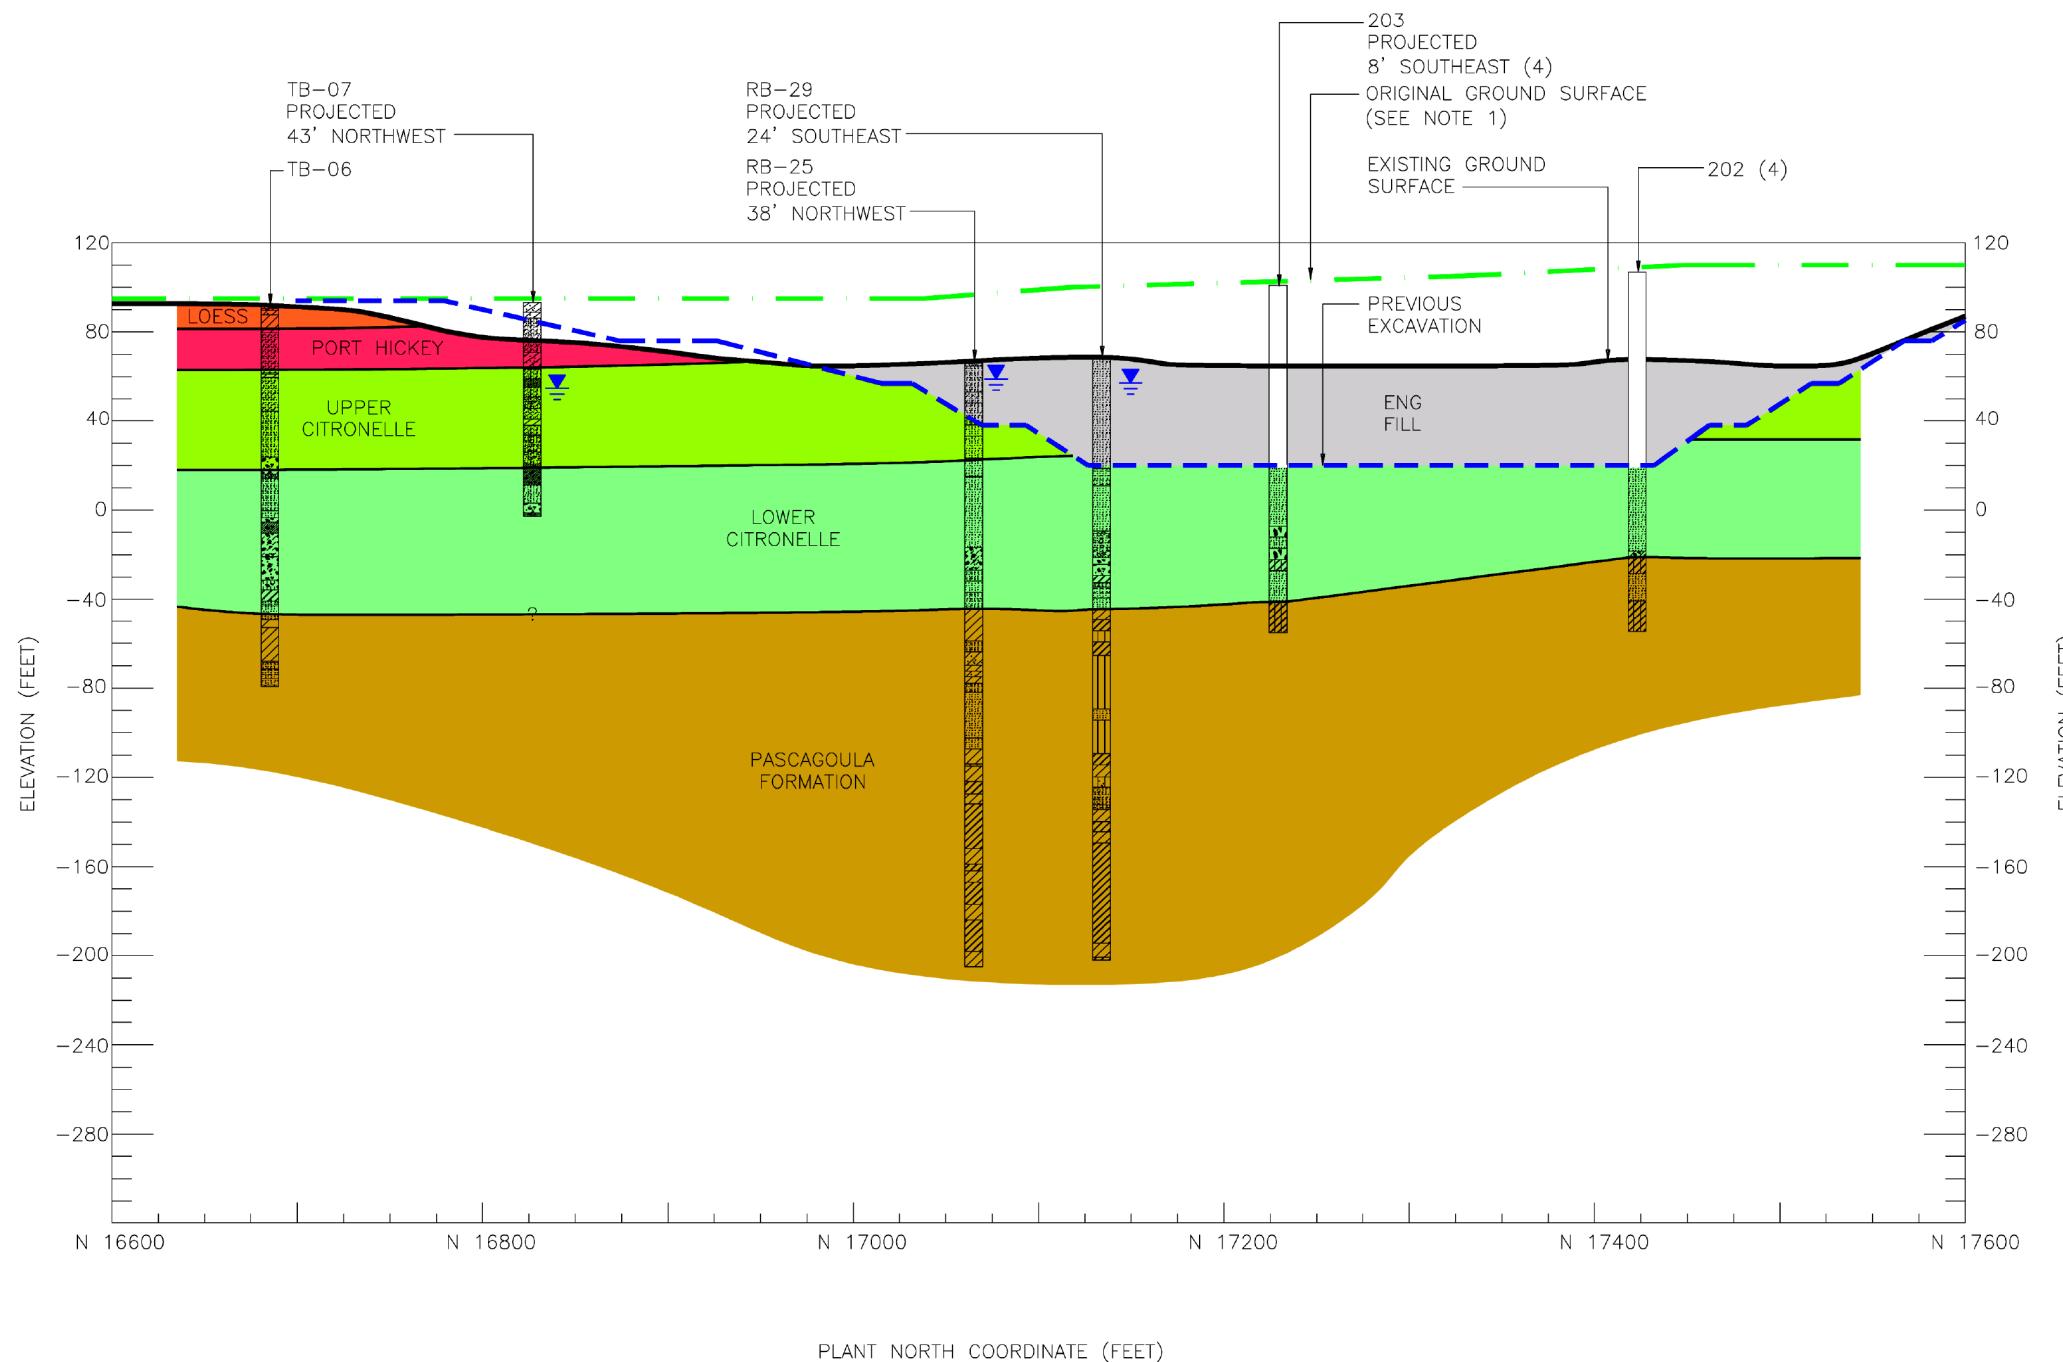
North-South Cross Section through Unit 3 Site Location
